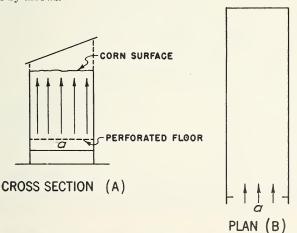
Perforated floor and tight side walls. The four crib walls are covered with canvas or paper to depth of corn. Air blown into plenum chamber at a beneath false perforated floor moves upward to surface of corn.
